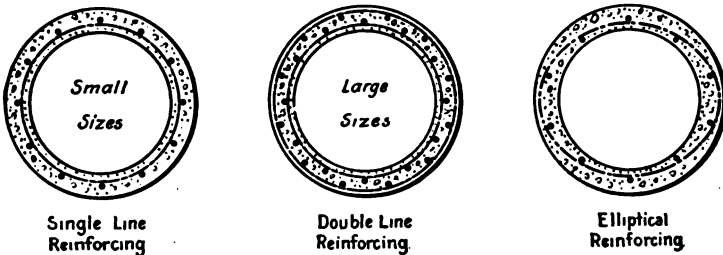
Triangle Mesh Reinforced Concrete Pipe.
